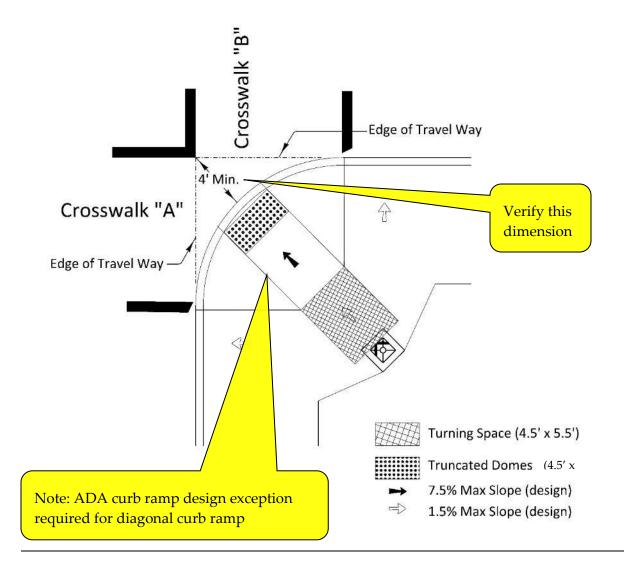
| 4' Minimum Distance Between Curb Ramp and Inside of Crosswalk Striping at Diagonal Ramp
